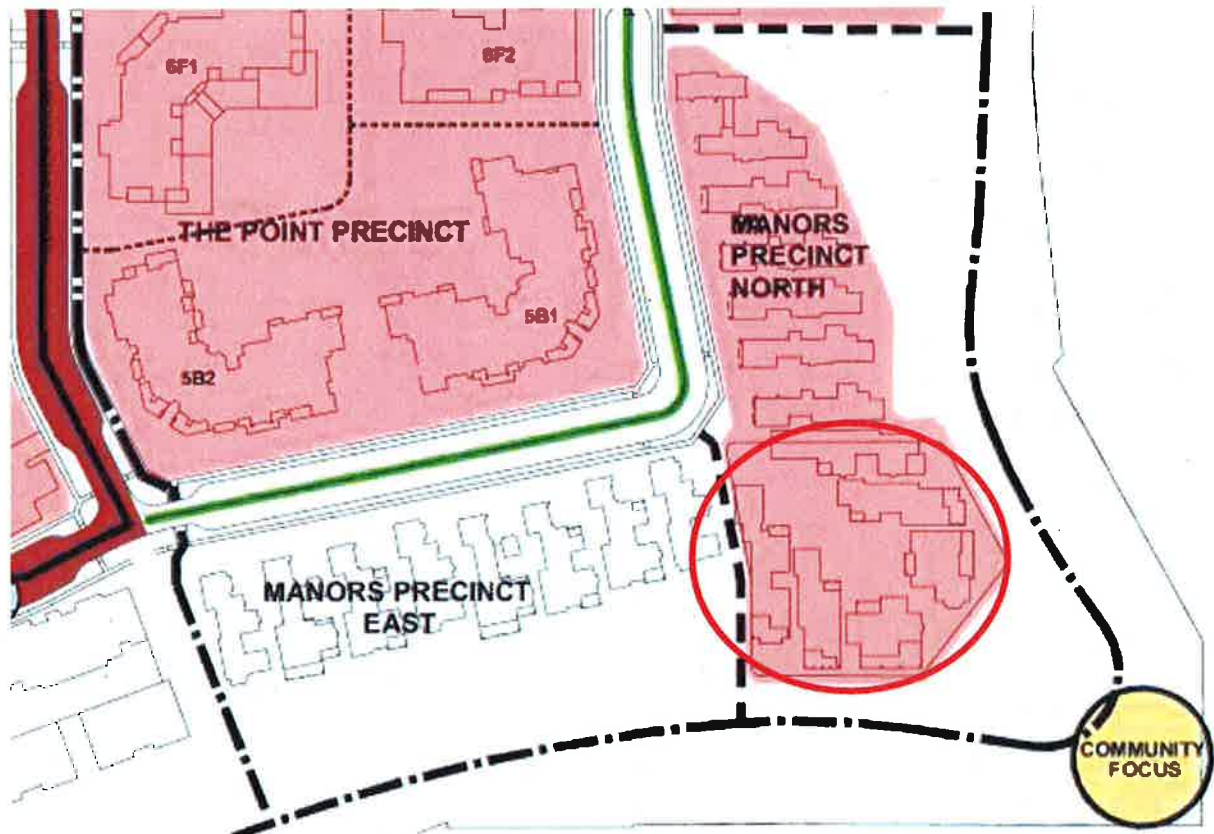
Concept Plan showing layout of proposed building envelopes to replace the Power House (circled in red)
